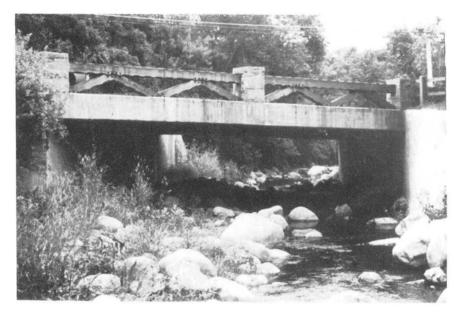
Hot Springs Road bridge over Montecito Creek (looking downstream at river mile 1.20).
